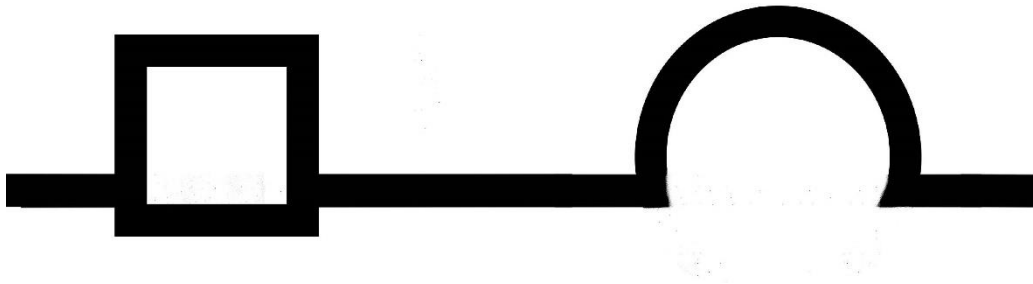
, the plan of a square and round tower (N.B. the general plan, not to scale, by author).
